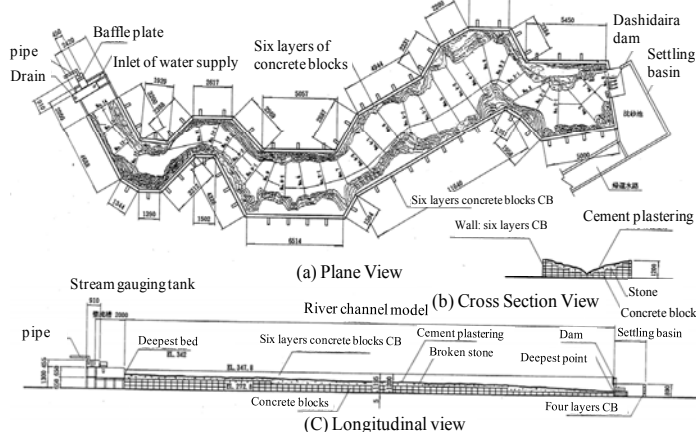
Dimensions and laboratory setup of Dashidaira dam (a) Plan view; (b) Cross section; (c) Longitudinal view
